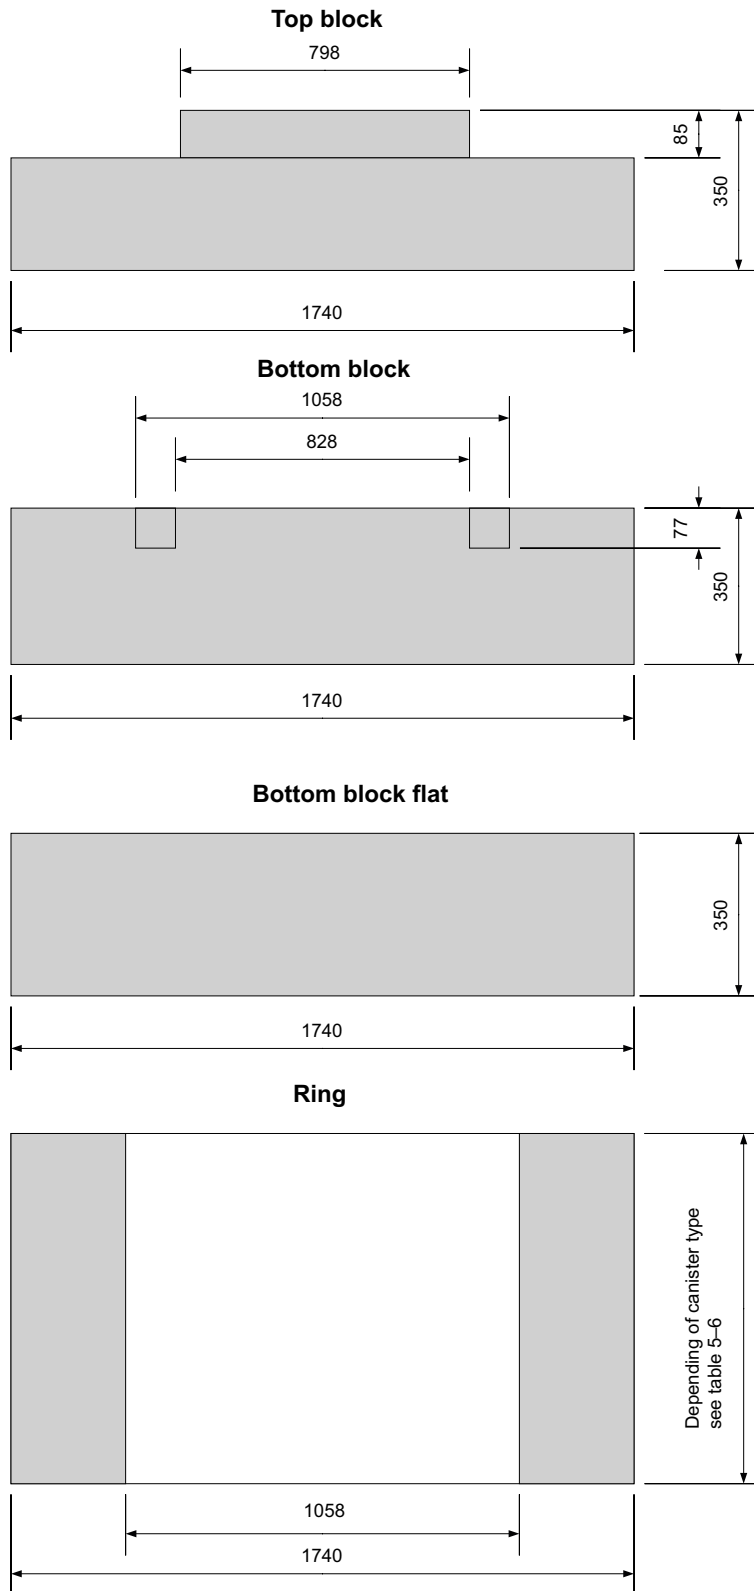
Schematic drawing of the bentonite buffer. The “bottom block” is for SKB’s canisters with welded bottom lid and the “bottom block flat” is for Posiva’s canisters with integral (flat) bottom.
